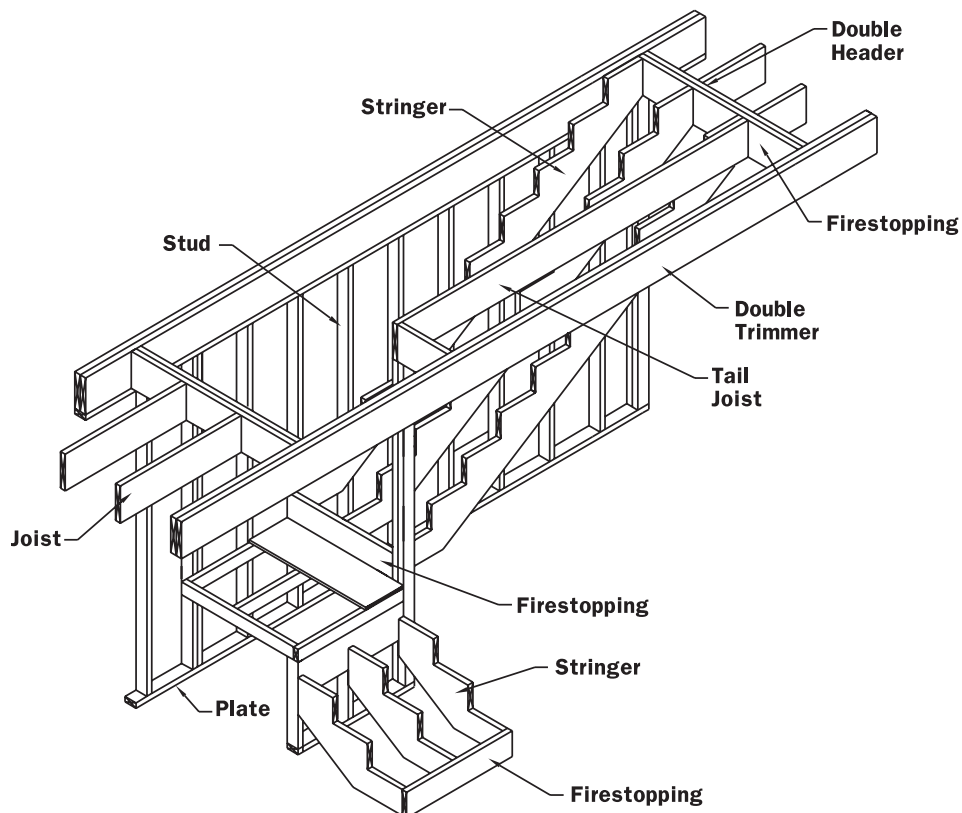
Floor Opening - StairwayFigure 3.6b Floor Opening - Stairway With Landing
